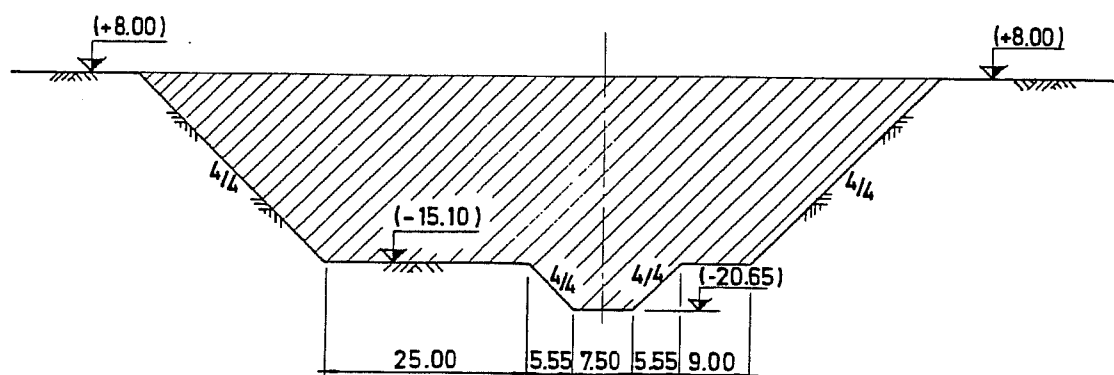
CROSS - SECTION OF THE EXCAVATION AT THE UPSTREAM HEAD
